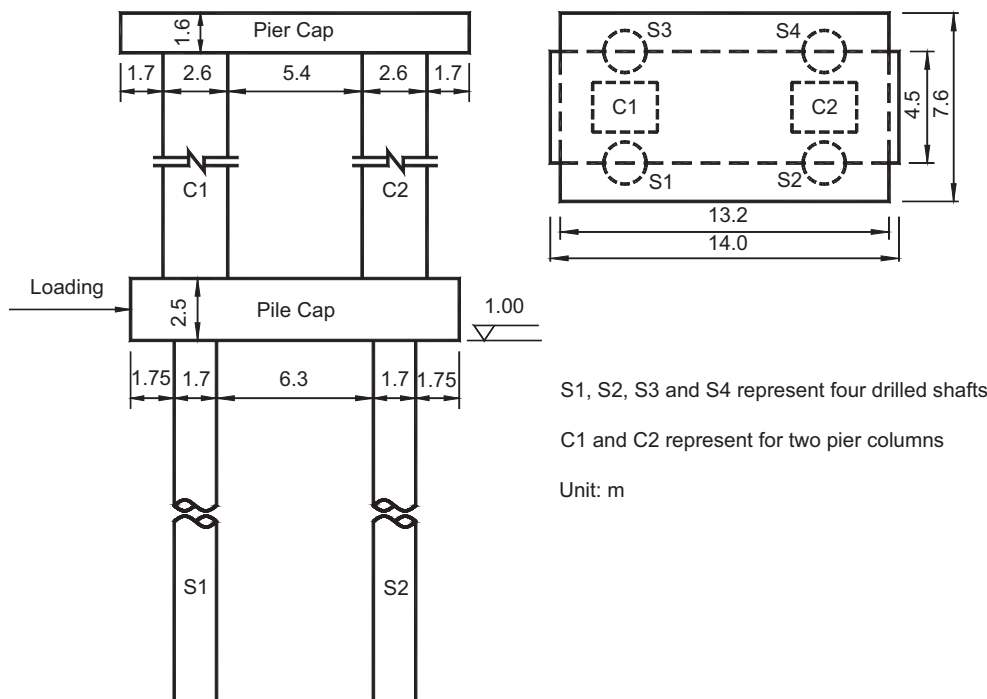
Front view of Jiujiang Bridge (elevations in meter).
